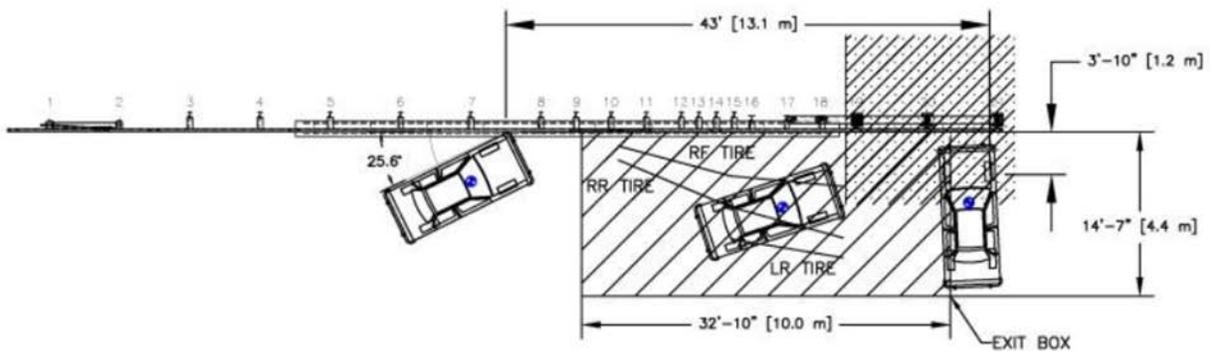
Test Impact Drawings for Test No. MWTC-2.
